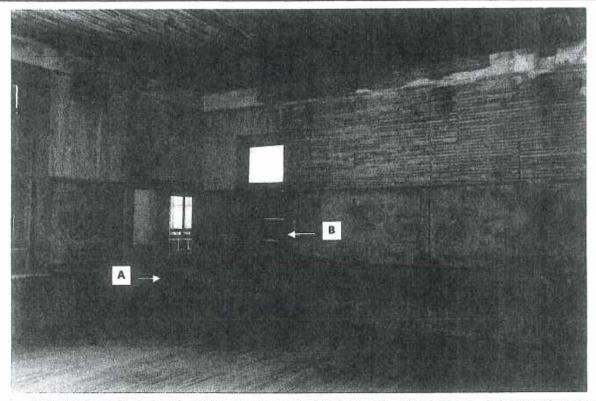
Room 16 view southeast. (A) 3-paneled door with side lite transom. (B) Door Type 4 - Interior Double-Acting.
